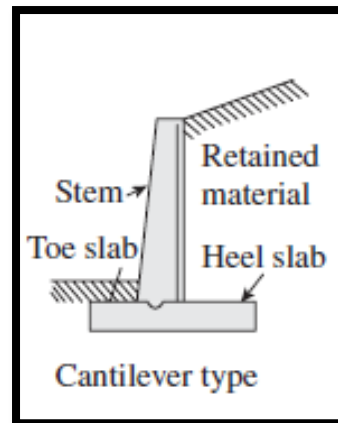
Parts of a Typical Cantilever Retaining Wall, [5]
